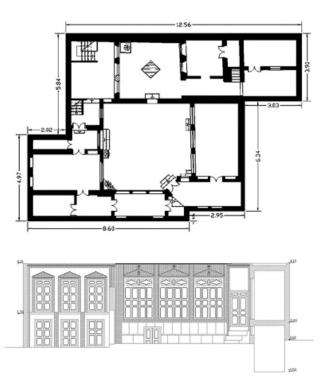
Plan and Façade of the Historical Ali Monsieur House
